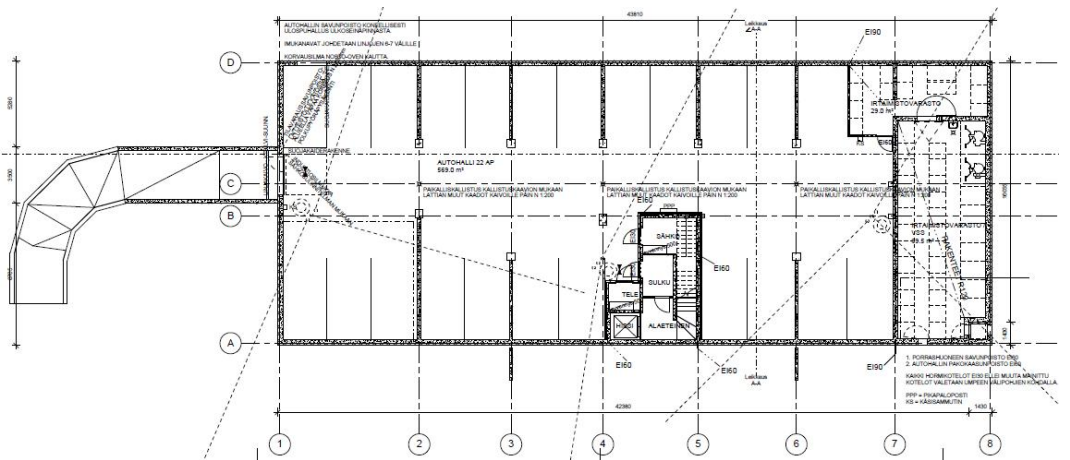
The floor layout of the basement floor, which is used as a parking hall.
